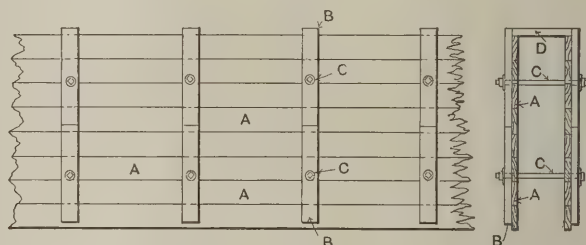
Elevation and Cross-section of Typical Wall "Form."
